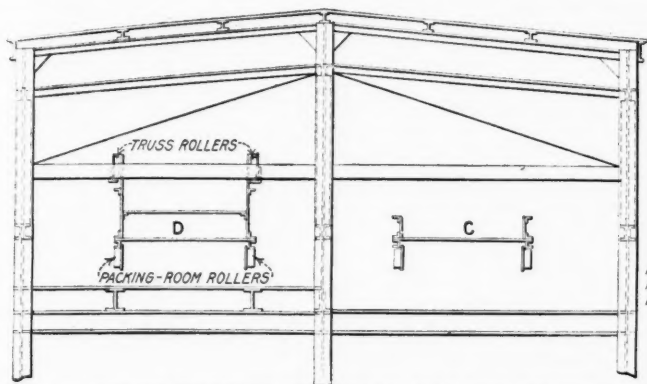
CROSS-SECTION THROUGH MARCUS CONVEYORS
